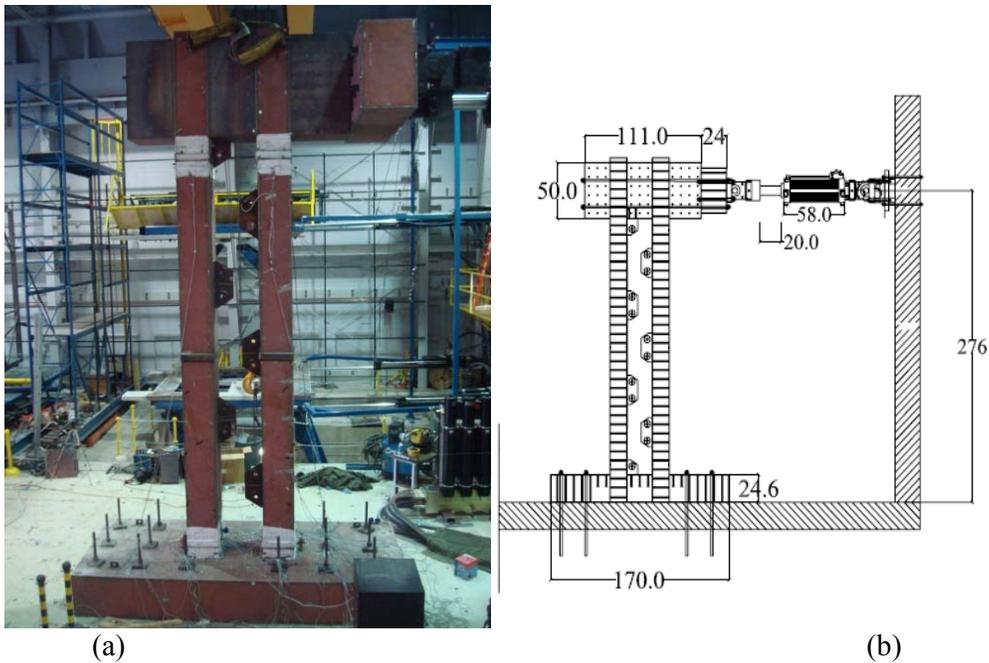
Experiment Setup (a) General View of the Experiment, (b) Bare Bridge Pier
